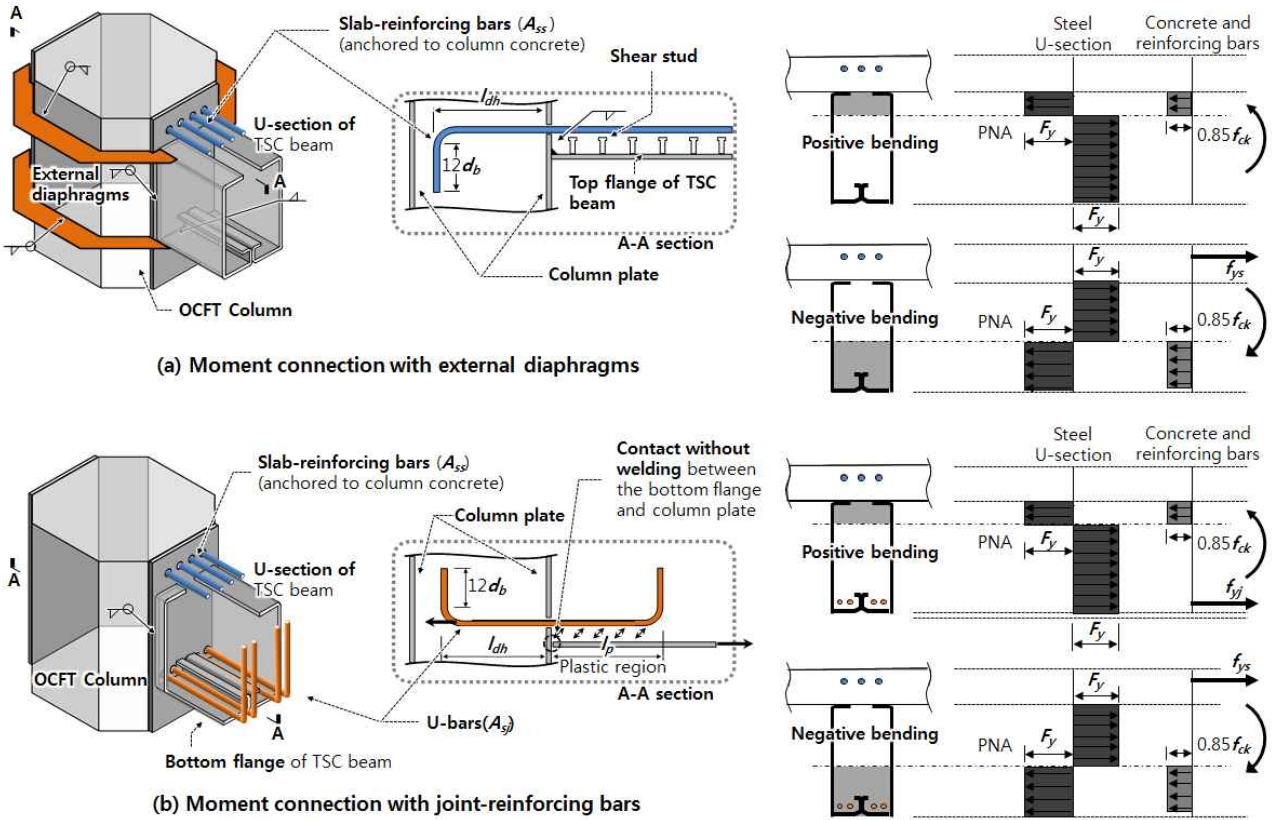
Moment connection details for exterior TSC beam – to – OCFT column connection
